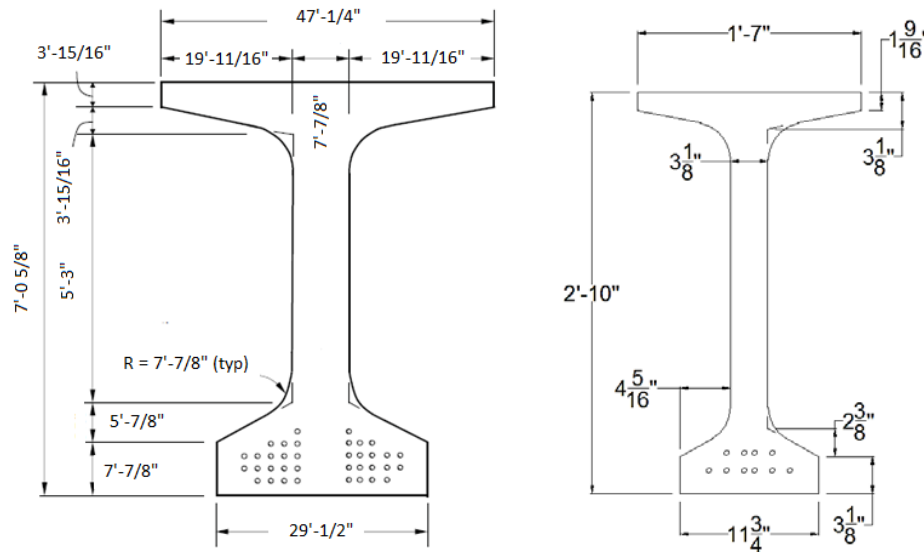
Cross-sections of prototype girder (left) and scaled test unit girder (right)
